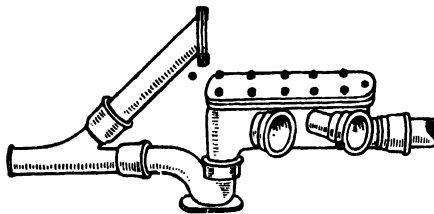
C.-I. intercepting chamber with bottom outlet and bolted cover to clearing arm, often used with standard trap.
